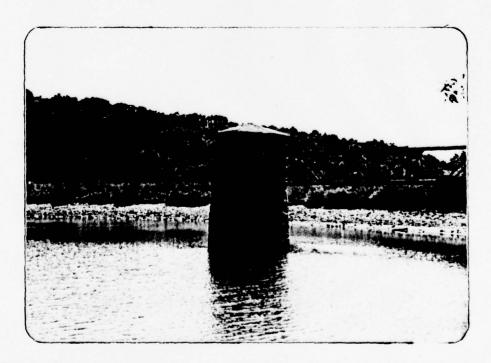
View Looking Downstream at Intake Tower and Upstream Slope of Embankment
